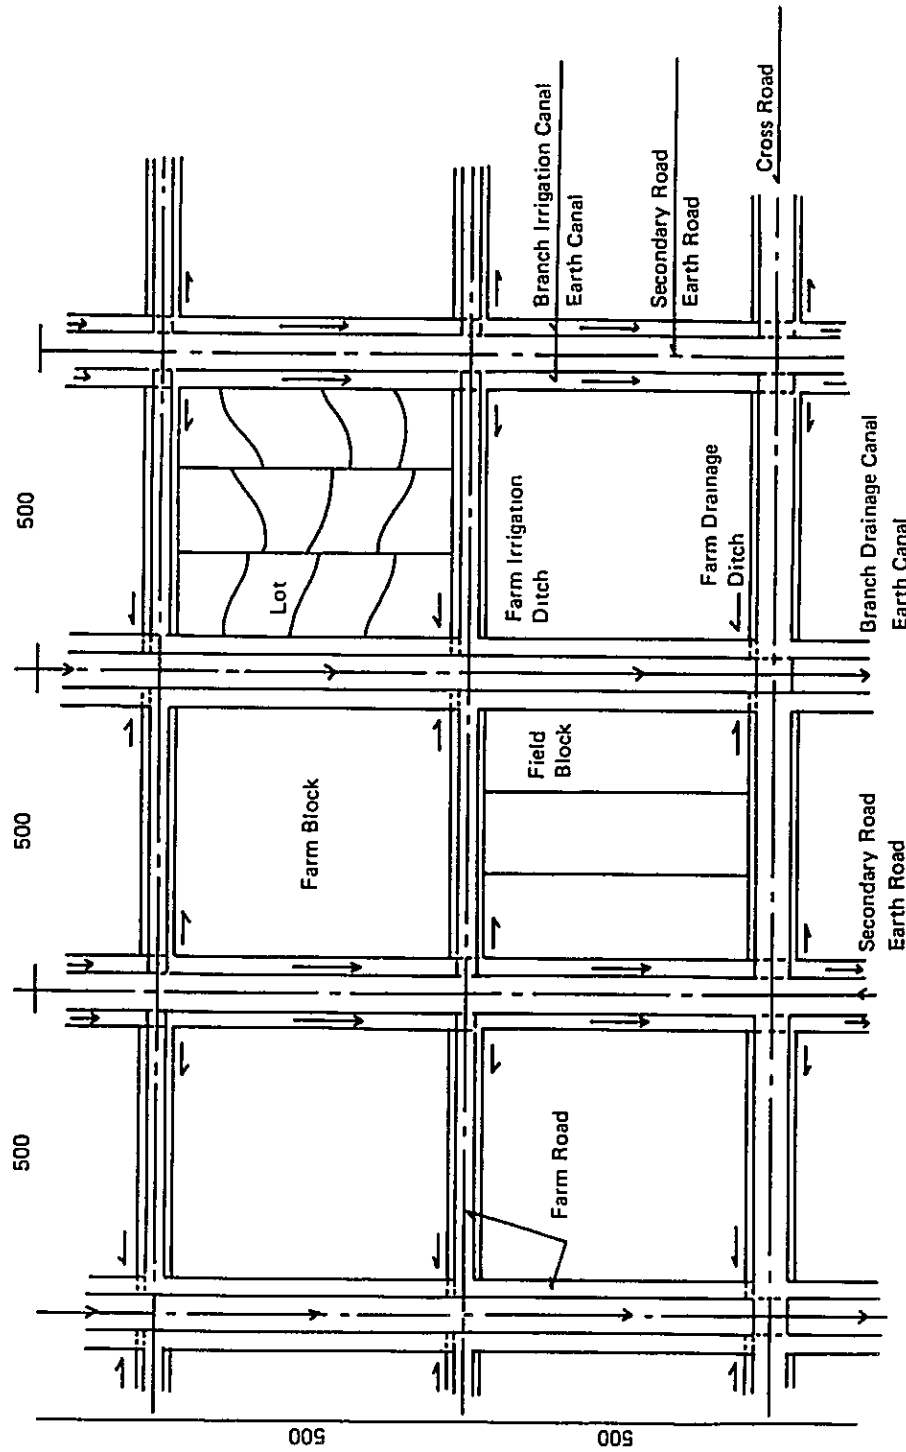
Layout of On-farm Plan (Unit: m)
